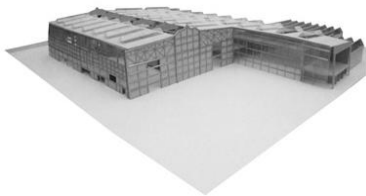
Opening in the roof will permit to have a better lightning in the interior.
